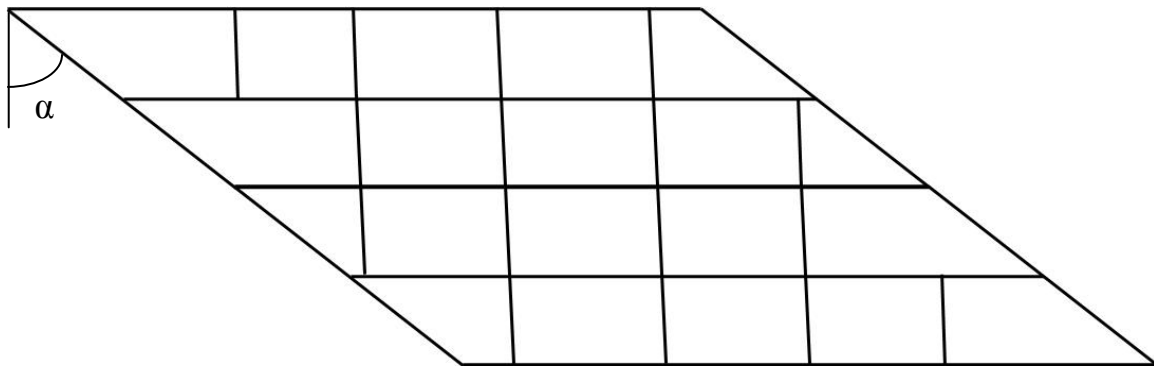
Skewed Bridge with Perpendicular Bracing Layout
